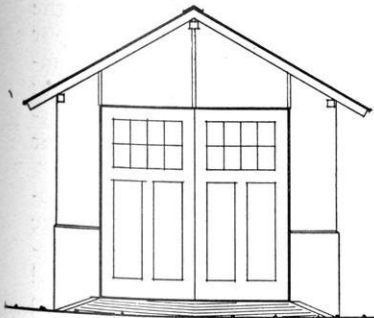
FIGURE FOUR: FRONT ELEVATION OF GARAGE SHOWING METAL COVERED DOORS, CONCRETE FOUNDATION WALL, AND PANELS OF "TRANSITE ASBESTOS LUMBER" ABOVE WITH BATTEN STRIPS OVER JOINTS.
